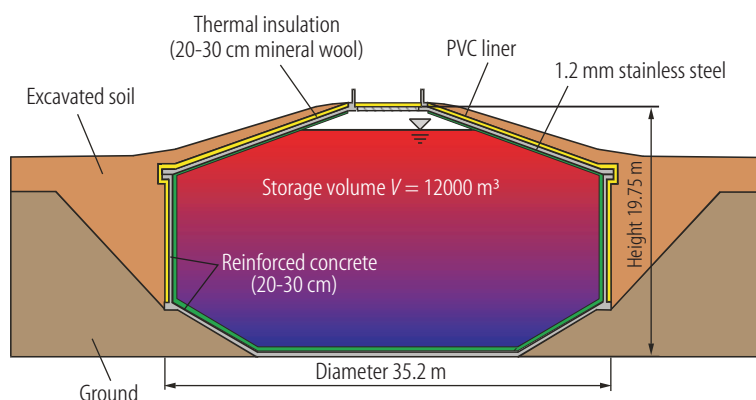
shows a schematic cross section of the heat storage (volume  $12000 \text{ m}^3$ ): the concrete ceiling is conically shaped and does not need, unlike the storage in Hamburg, any pillars. It consists of a supporting structure of reinforced concrete with an outside heat insulation of mineral fiber. The insulation is only fixed at the vertical walls (ca. 30 cm) and at the ceiling (ca. 40 cm). The inside of the concrete container is lined with a steam tight 1.2 mm plate of stainless steel. The building cost referred to the volume amount to  $123 \text{ €/m}^3$ .
